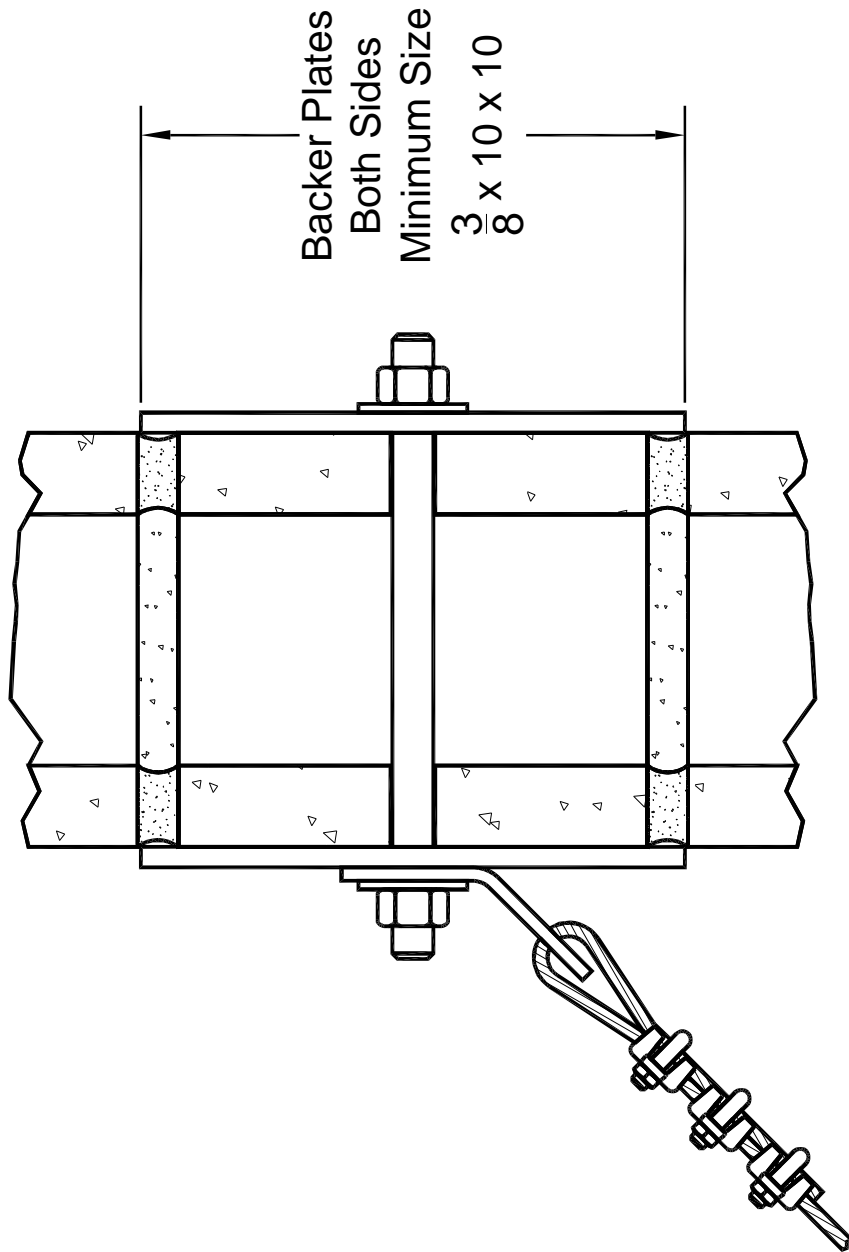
; KSCC Through Bolt Attachment to a Hollow CMU Wall
